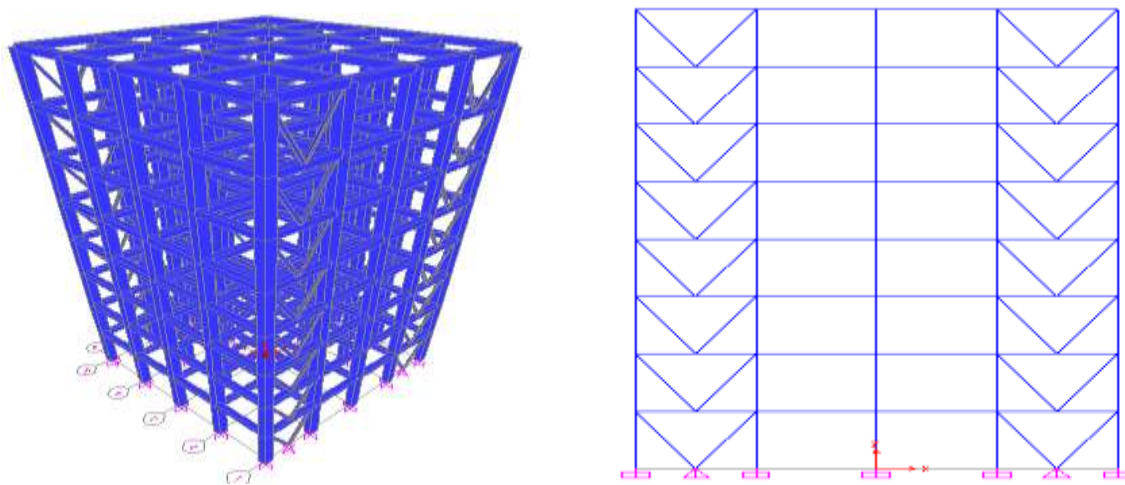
3-D and Elevation View of V Braced Frame Structure
